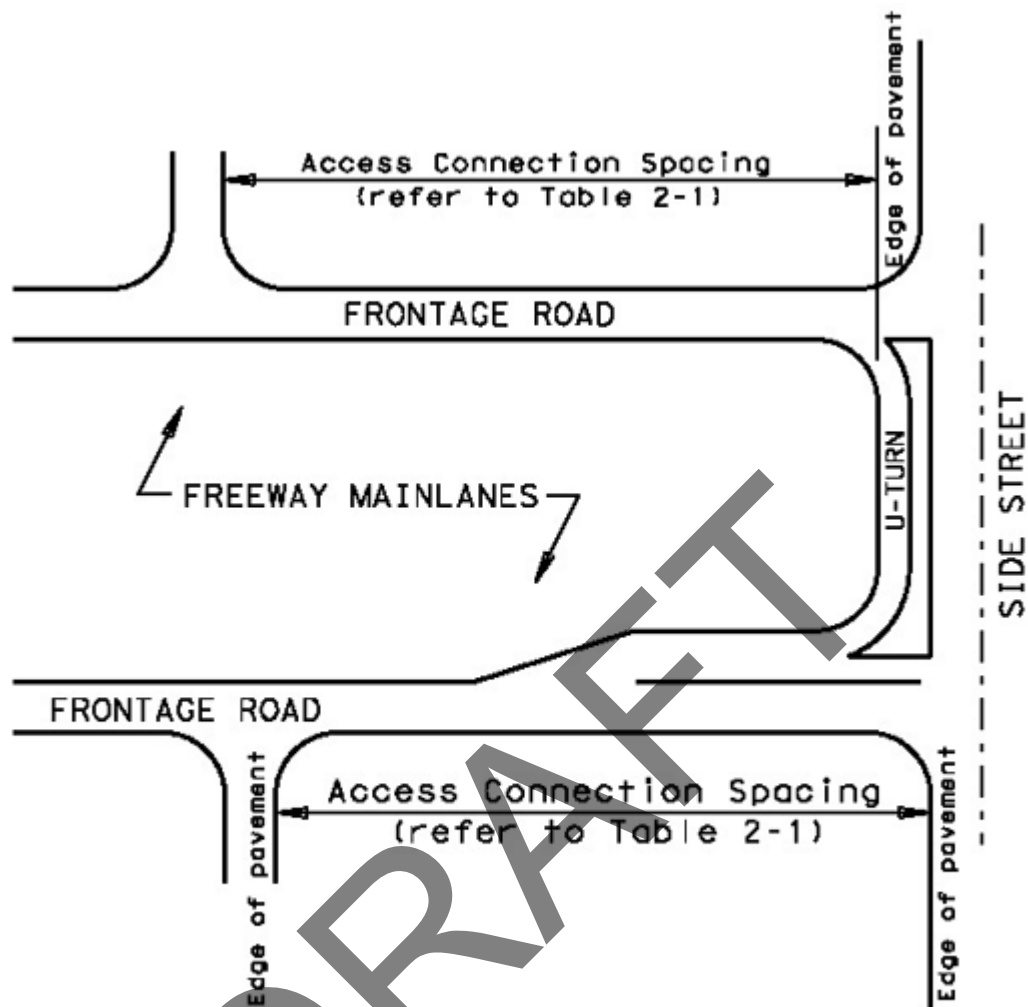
Frontage Road U-Turn Spacing Diagram
